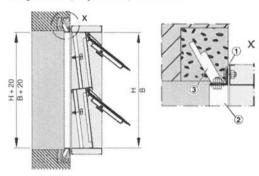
Wall installation with installation subframe (steel/stainless steel construction)
